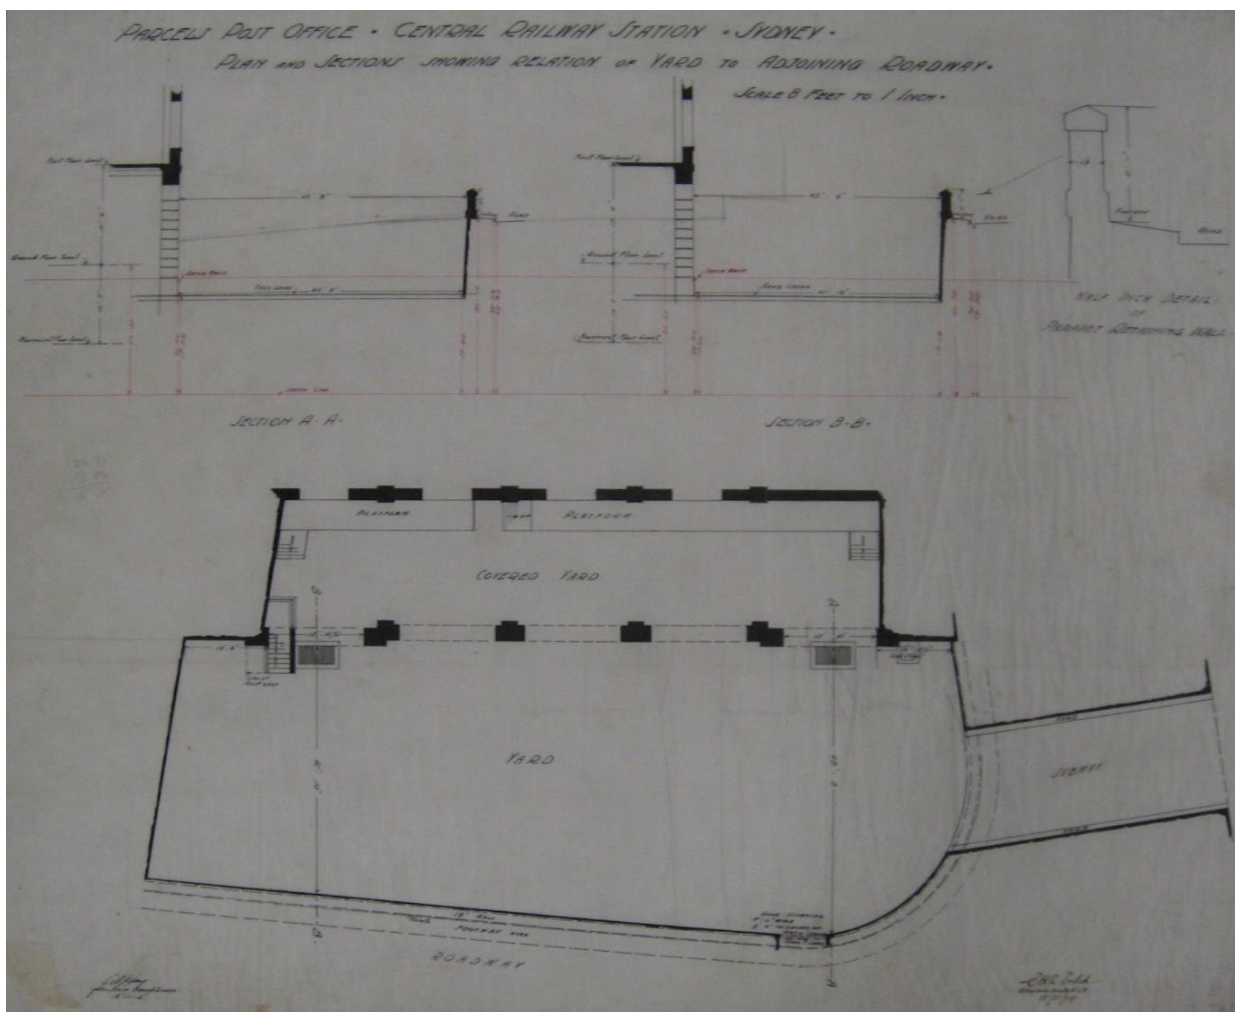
Parcels Post Office Central Railway Sydney, plan and sections showing relation of yard to adjoining roadway. Signed by George J Oakeshott (works Director).
